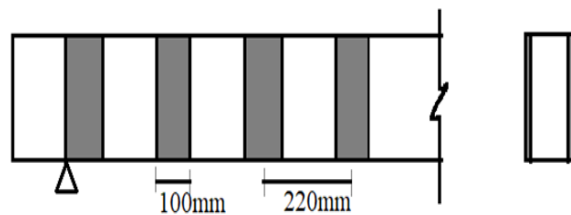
CFRP Strengthening of beam with 900 oriented side stirrups
